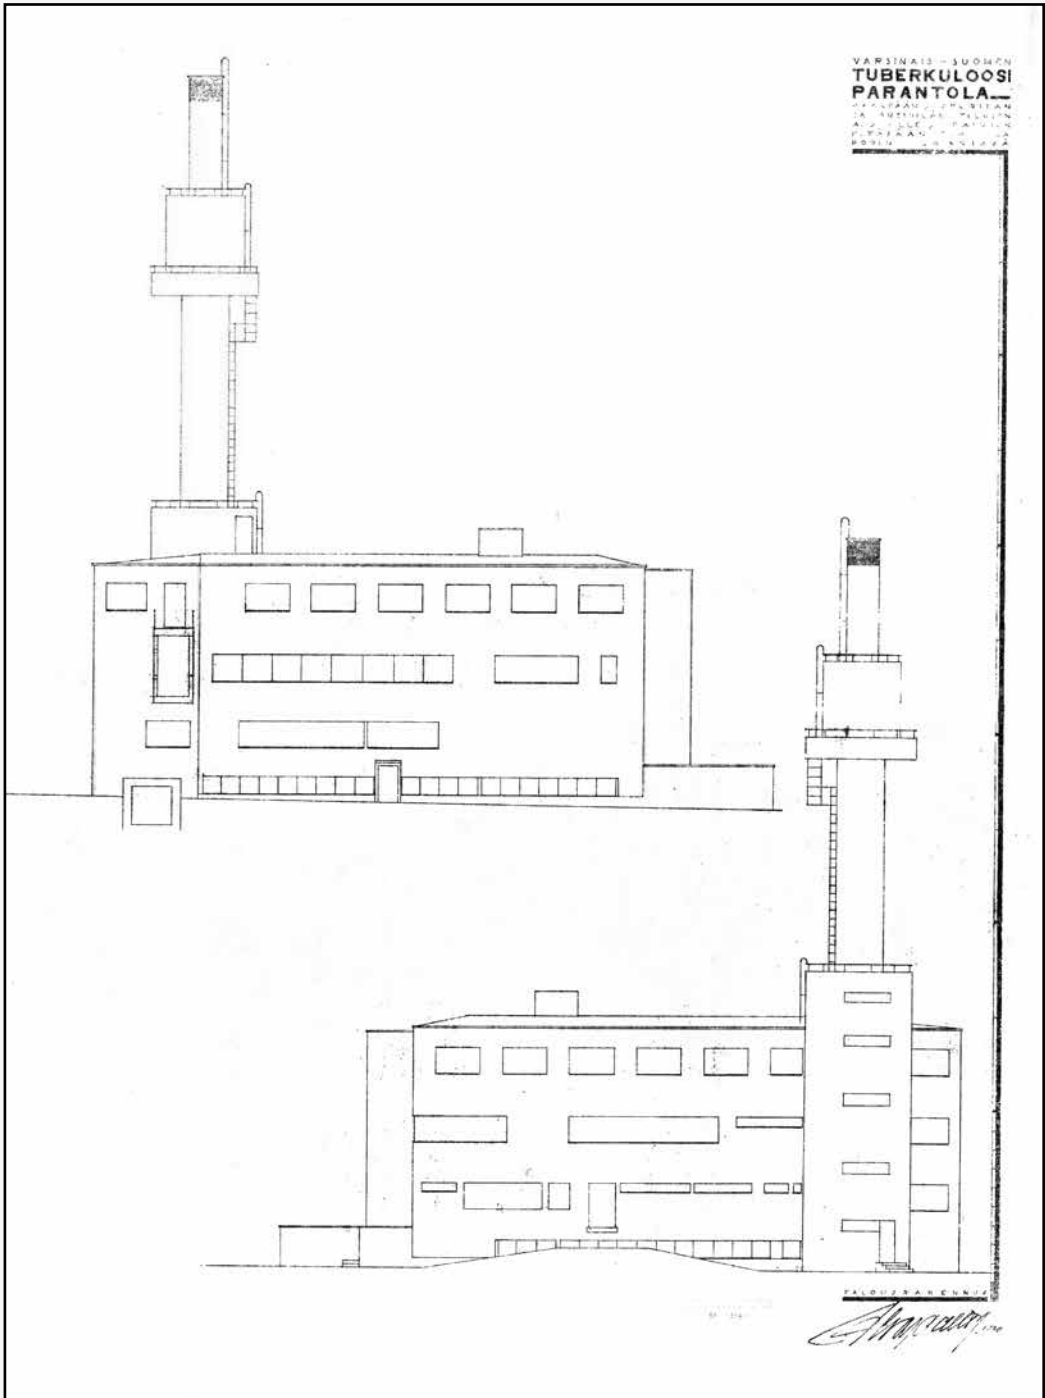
Master drawing of the C wing long façades facing southeast and northwest, April 1930. Drawing No. 50-108a. The drawing has been edited. AAM.
